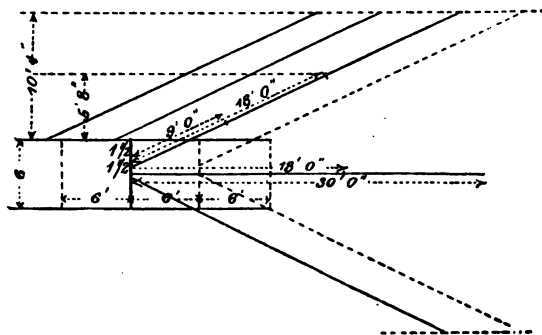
Plan of heading approaching old hollows, showing bore-holes.
